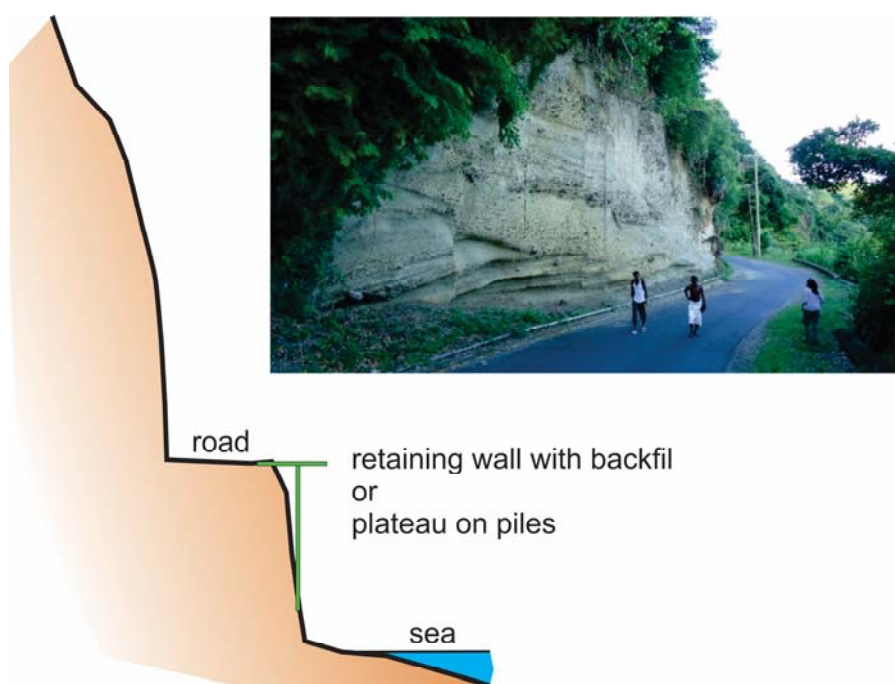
Road widening through retaining wall of plateau on piles instead of embankment of dumped material.
